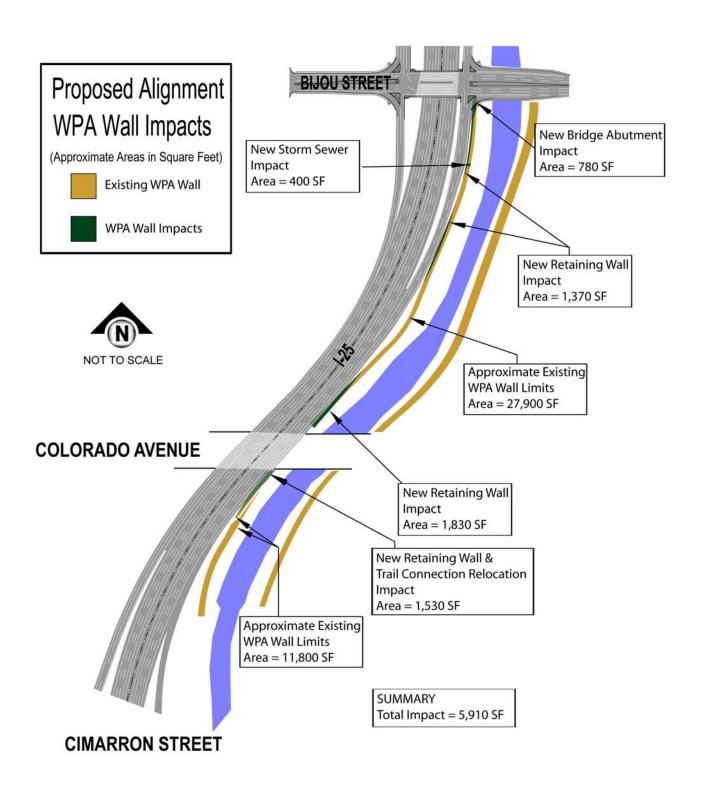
WPA Flood Wall Impacted Areas retaining walls and cantilevered roadway over the WPA wall and must be mitigated by a retaining wall design that is compatible with the original WPA wall. The final design will be submitted to SHPO for review and comment to ensure it is compatible with the WPA floodwall.
